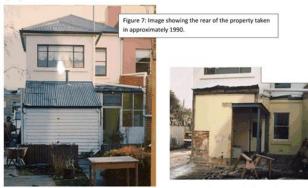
Applicant photo of rear elevation of the building prior to the 1990s extension (E3 Planning, 2020)
